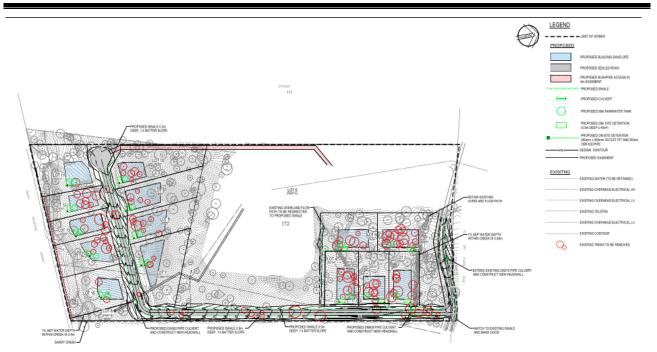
General Arrangement Plan demonstrating stormwater management (Page 4 of Plan Set)
